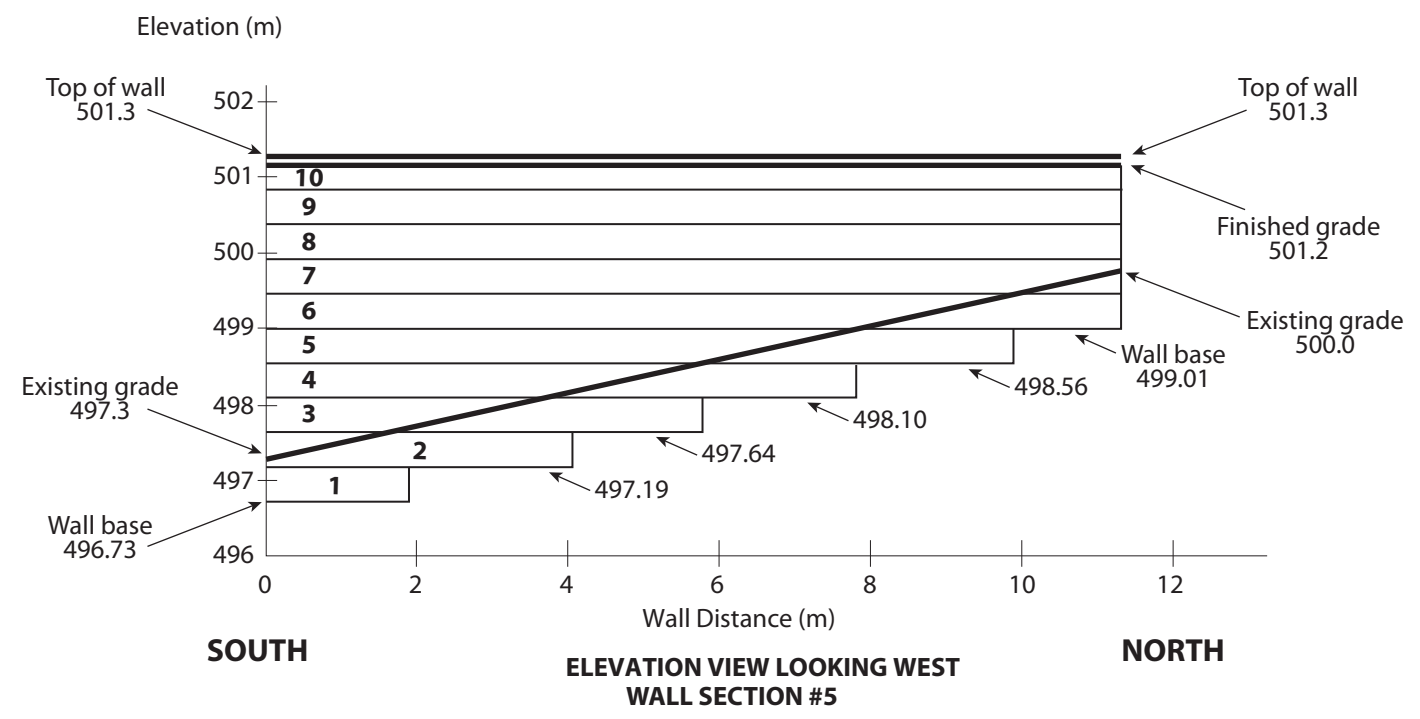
Installation Details Parking Lot Retaining Structure Design Taghum Shell 5644 Highway 3A, Taghum, BC
